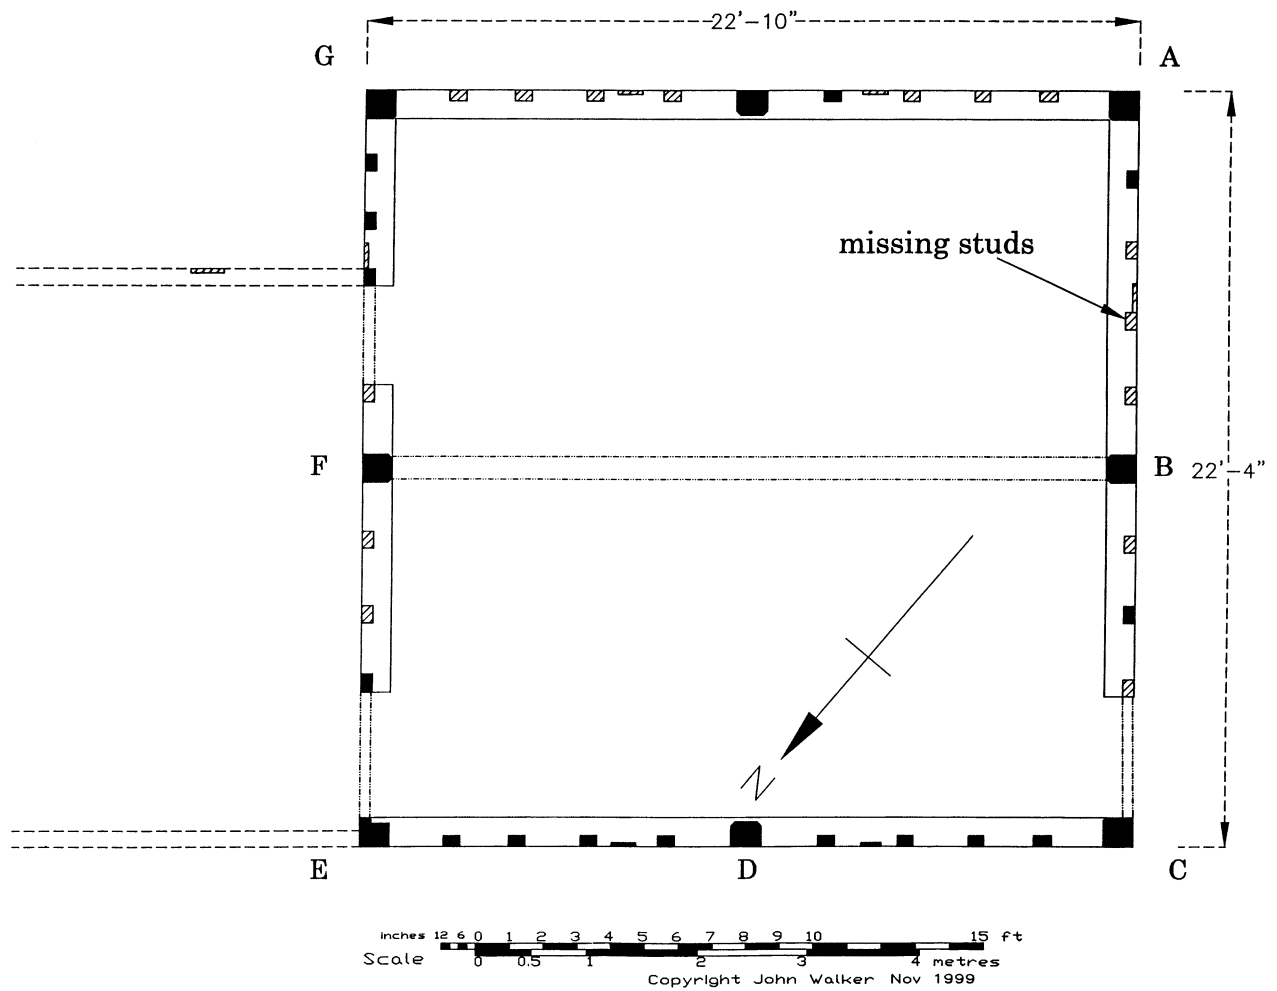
Plan of the Little Braxted kitchen. The hatched studs are missing or replaced (John Walker).
